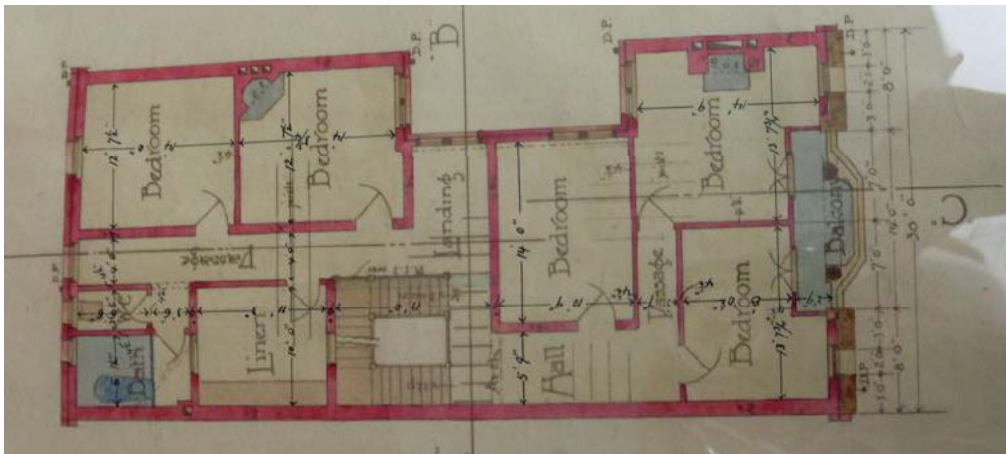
The third floor plan had a similar footprint to the second floor plan, the main difference being the principal elevation balcony
